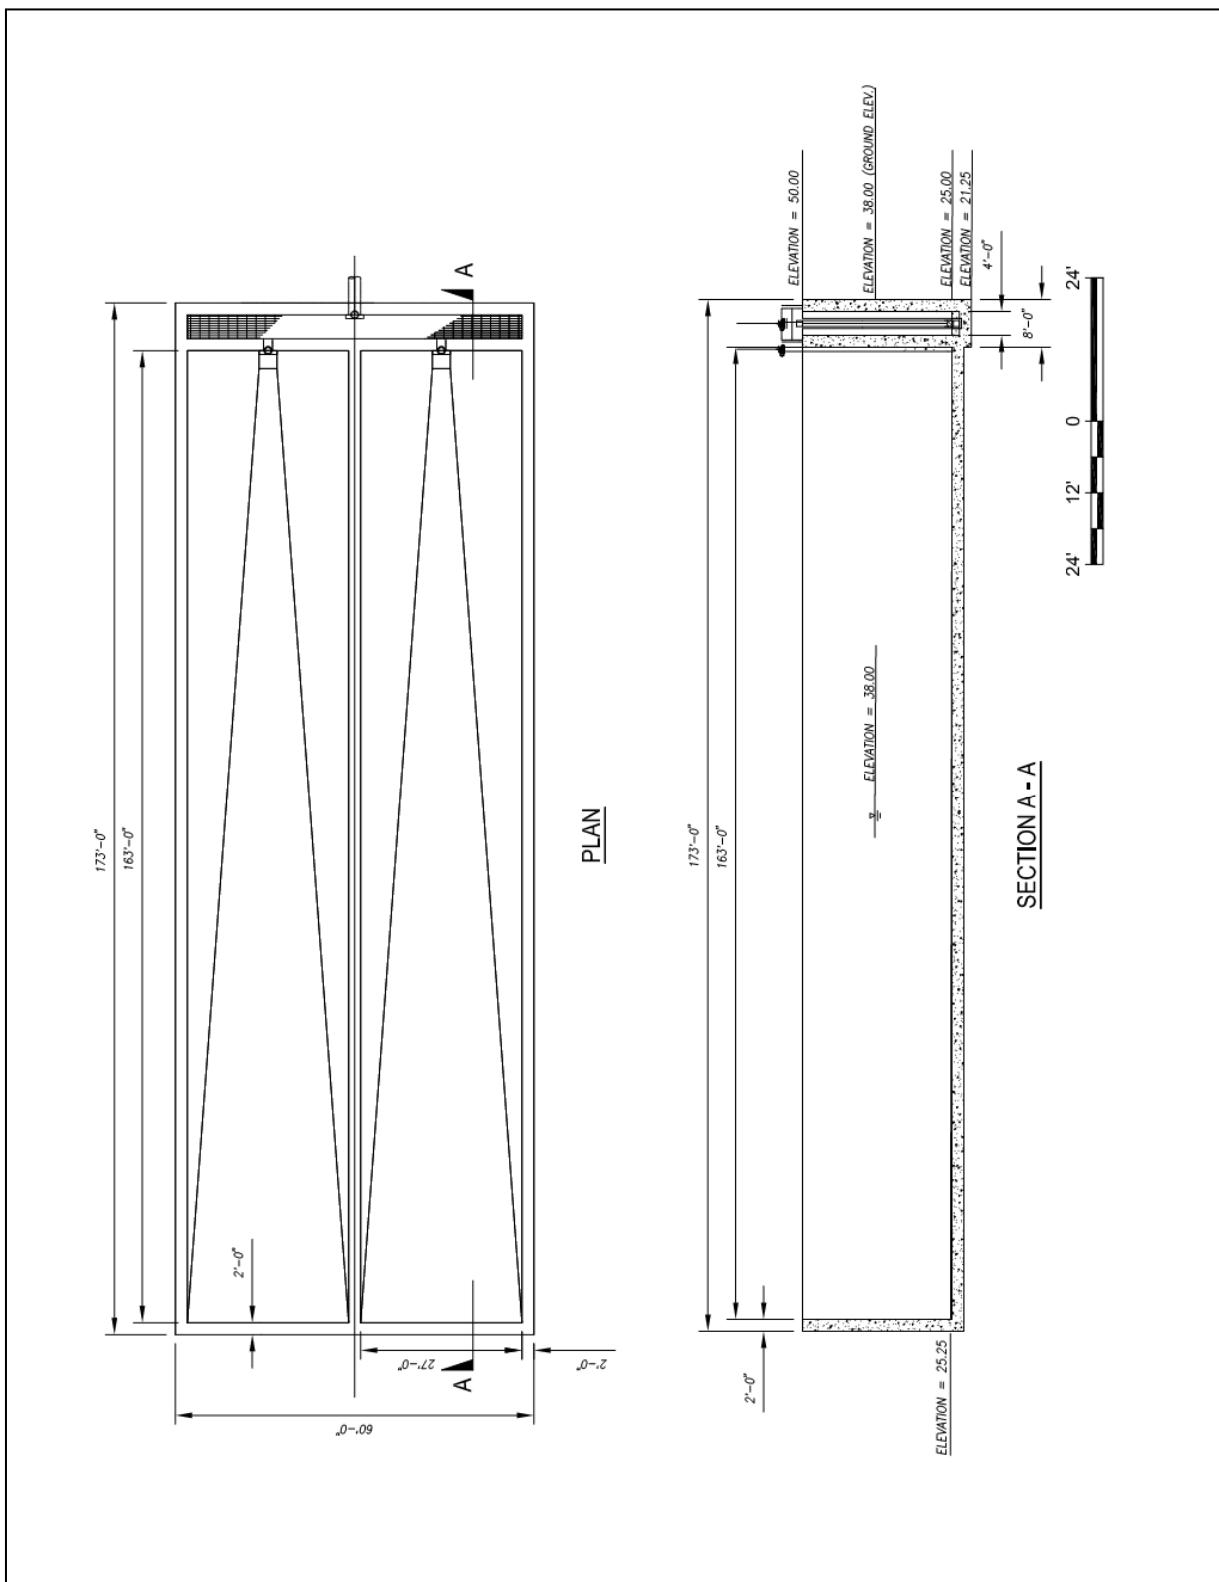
Option 3B: Plan and Section Views - 0.84 MG EQ Basin at Effluent Holding Pond
